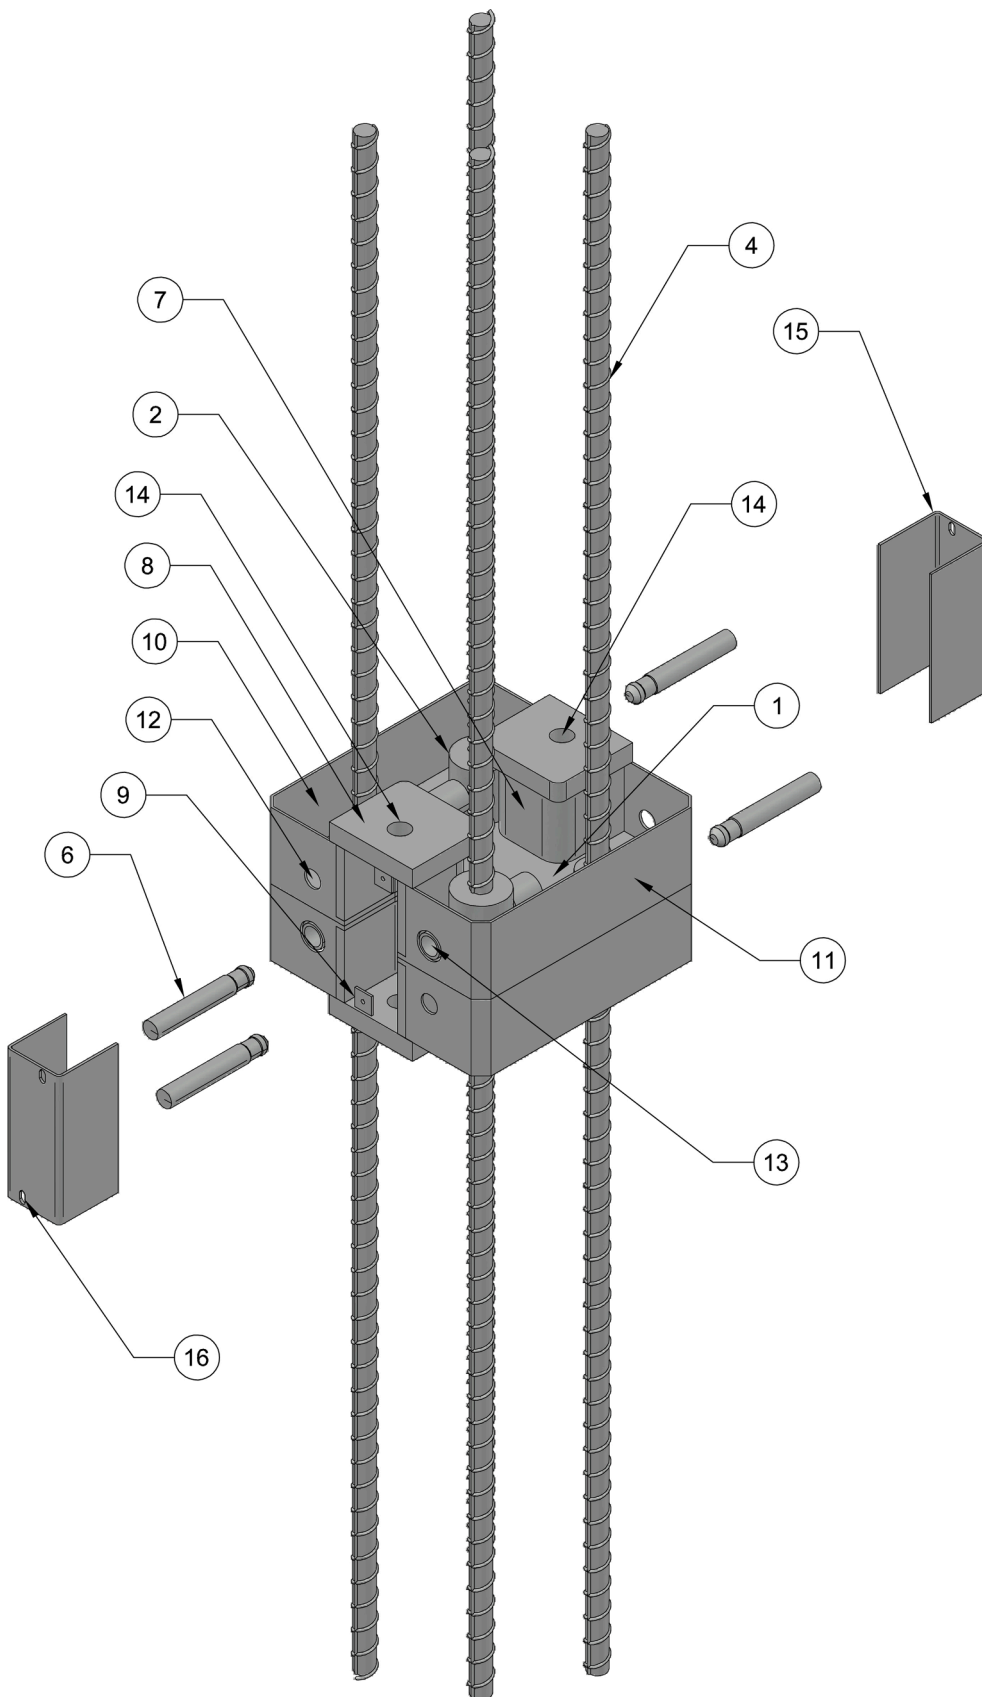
Isometric view of assembled 270-mm DEP joint.
